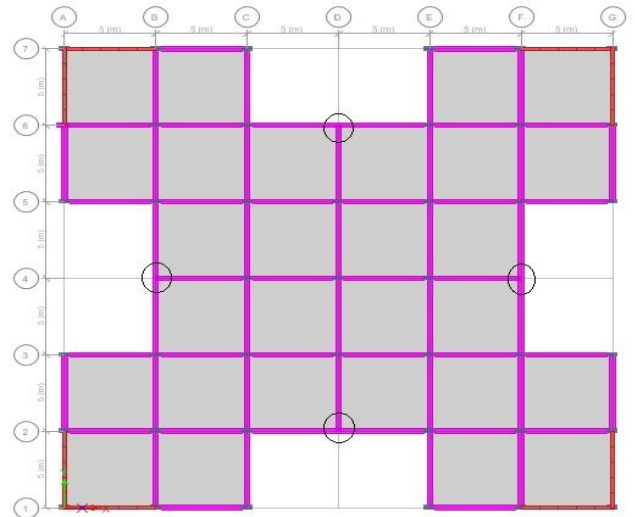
Plan view with floating columns at middle of penultimate bay
